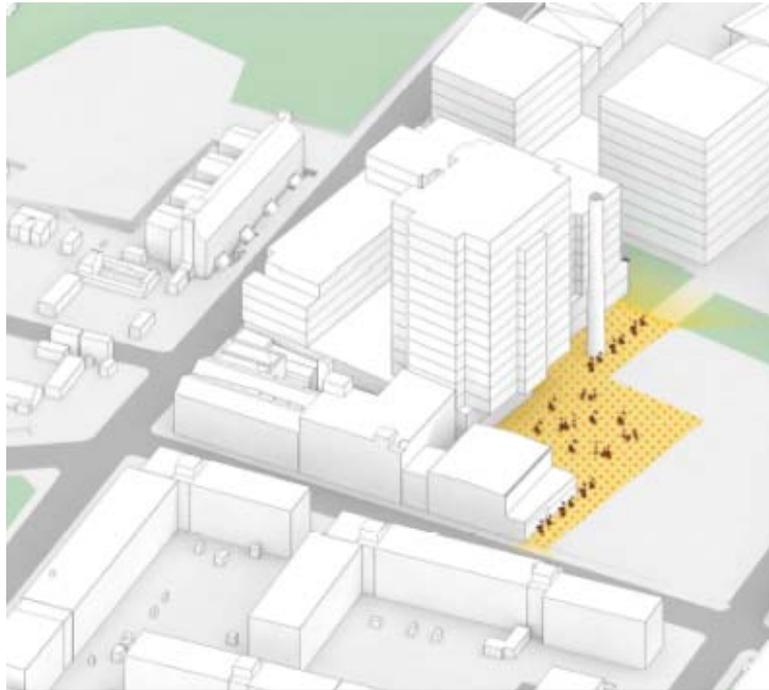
Illustrative image of the proposed route through Latona Yard from Latona Road to Road and to Bianca Road.
